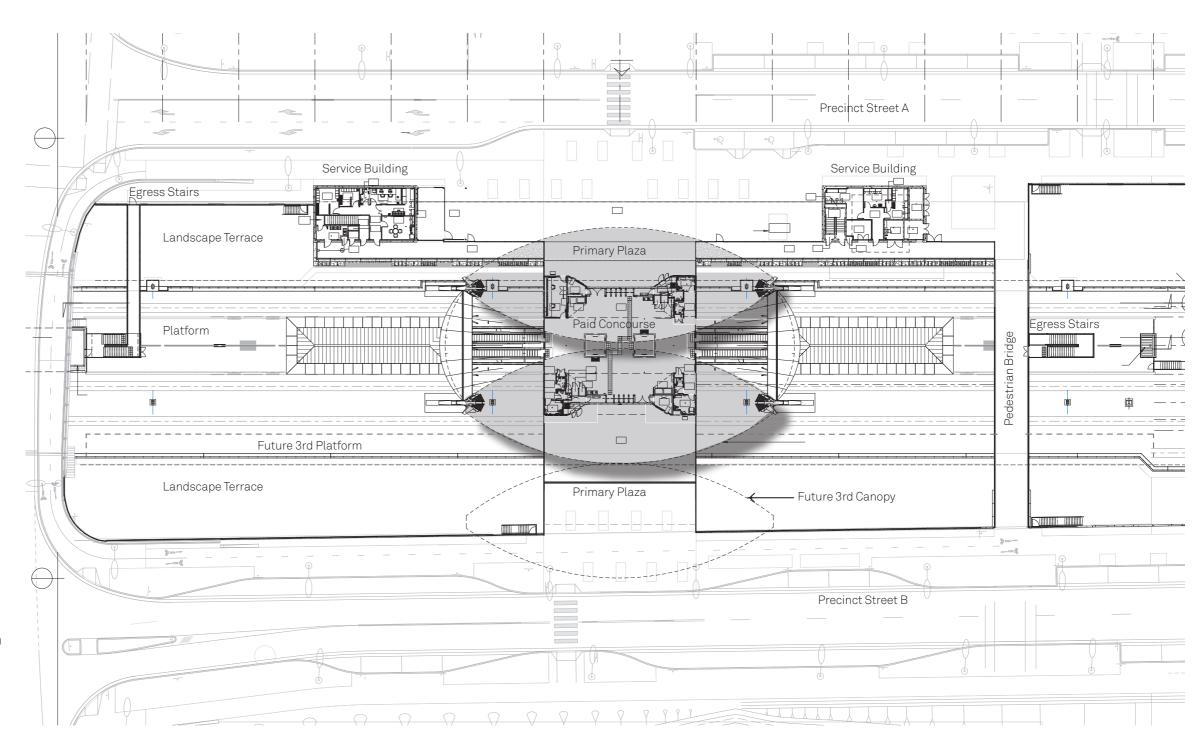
CUD\_Cudgegong Road Station Configuration. Source: HASSELL.
